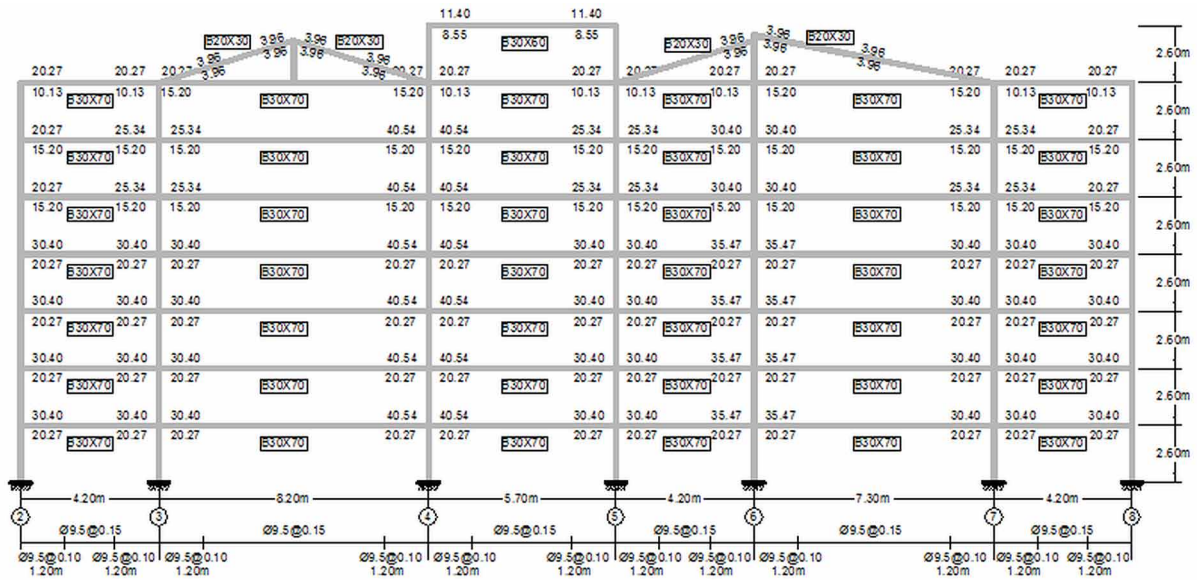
Residential building, geometry and reinforcement in columns of the frame C
